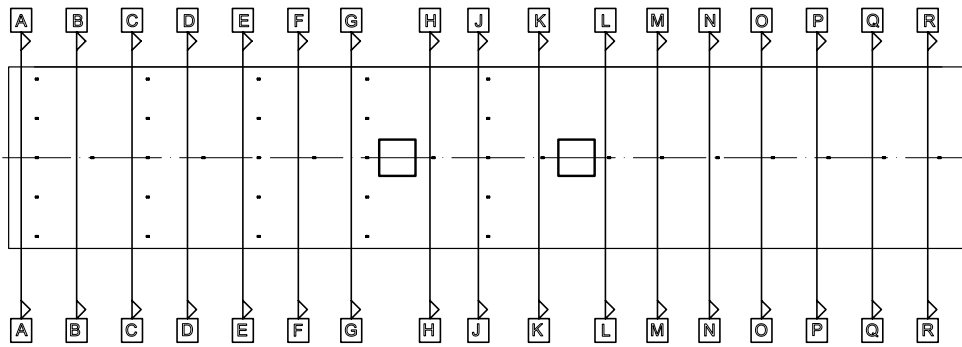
Bridge deck with arrangement of section axes and strain gages
